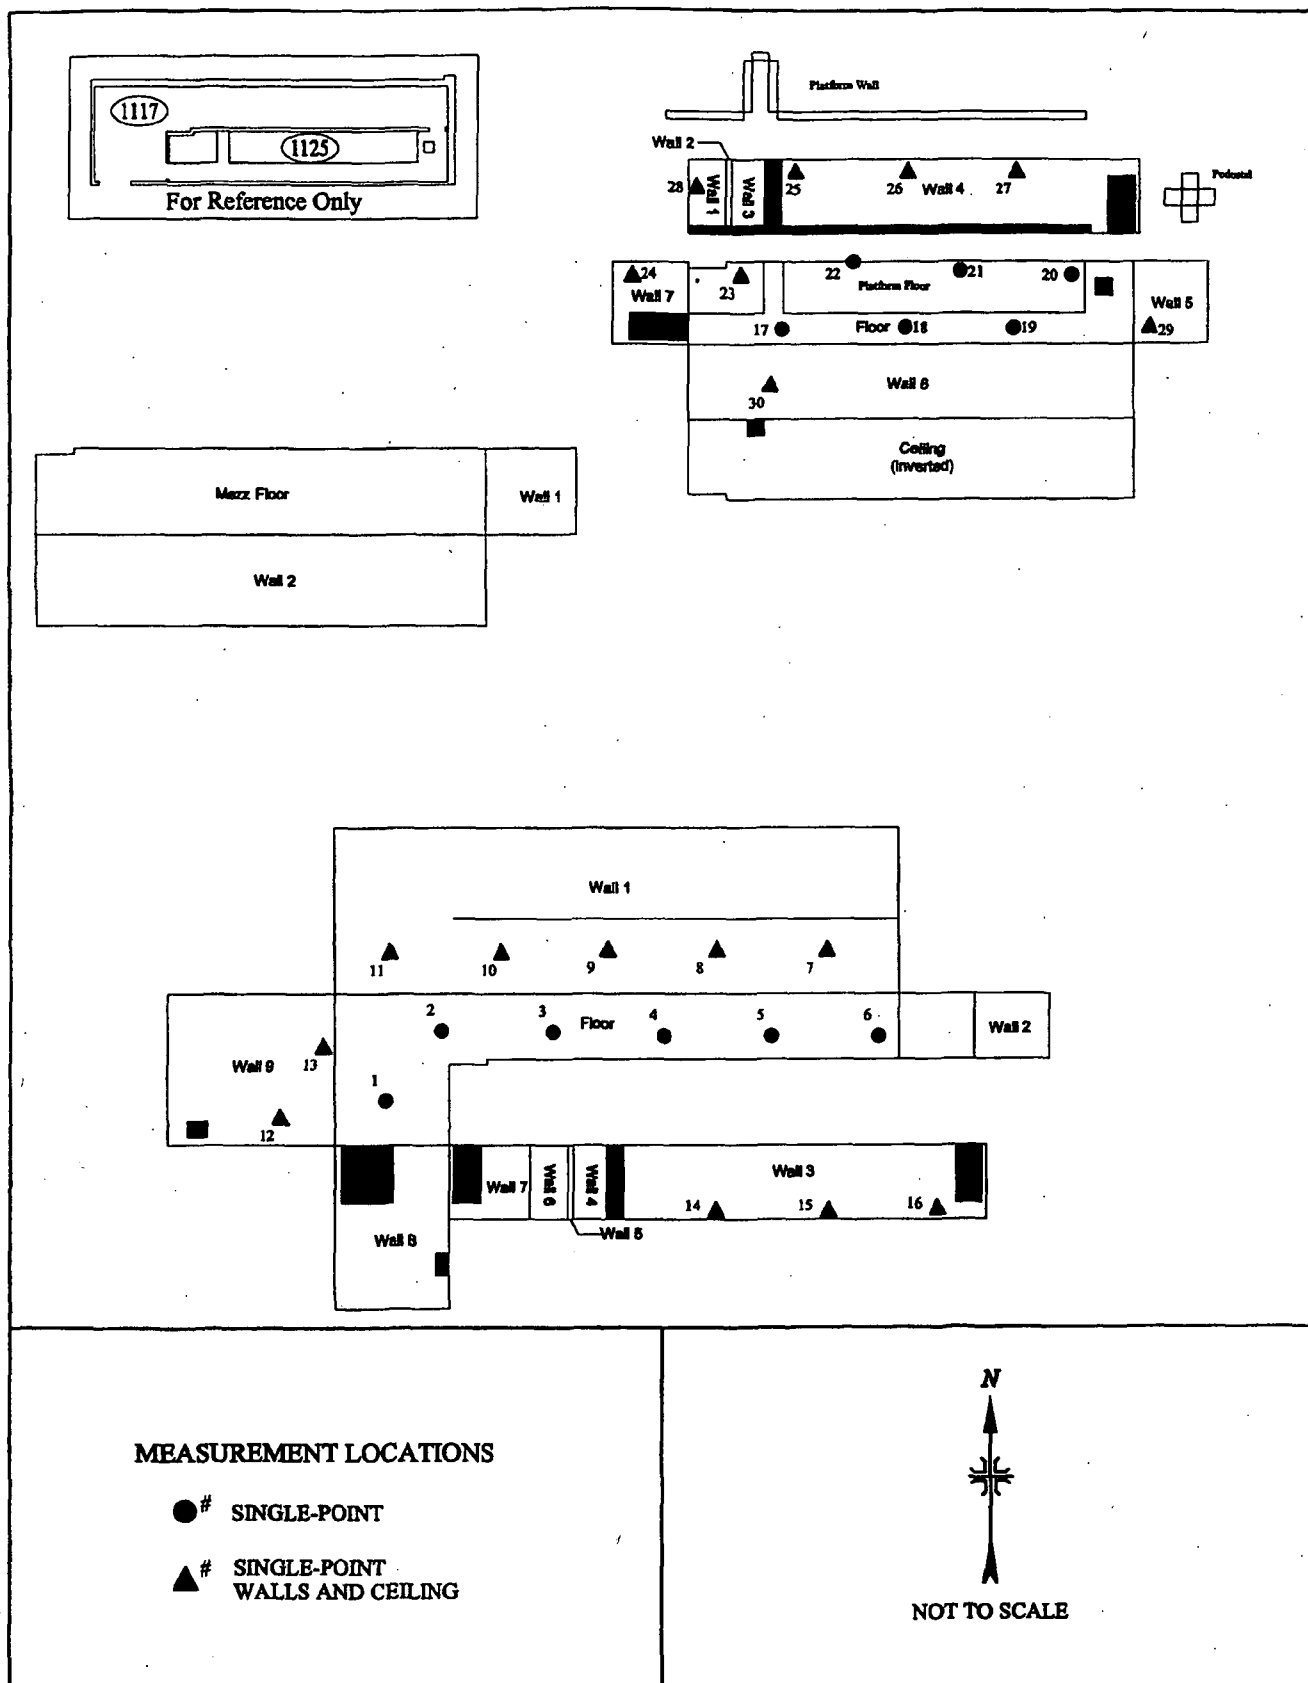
Building 371, Survey Area F - Measurement Locations
